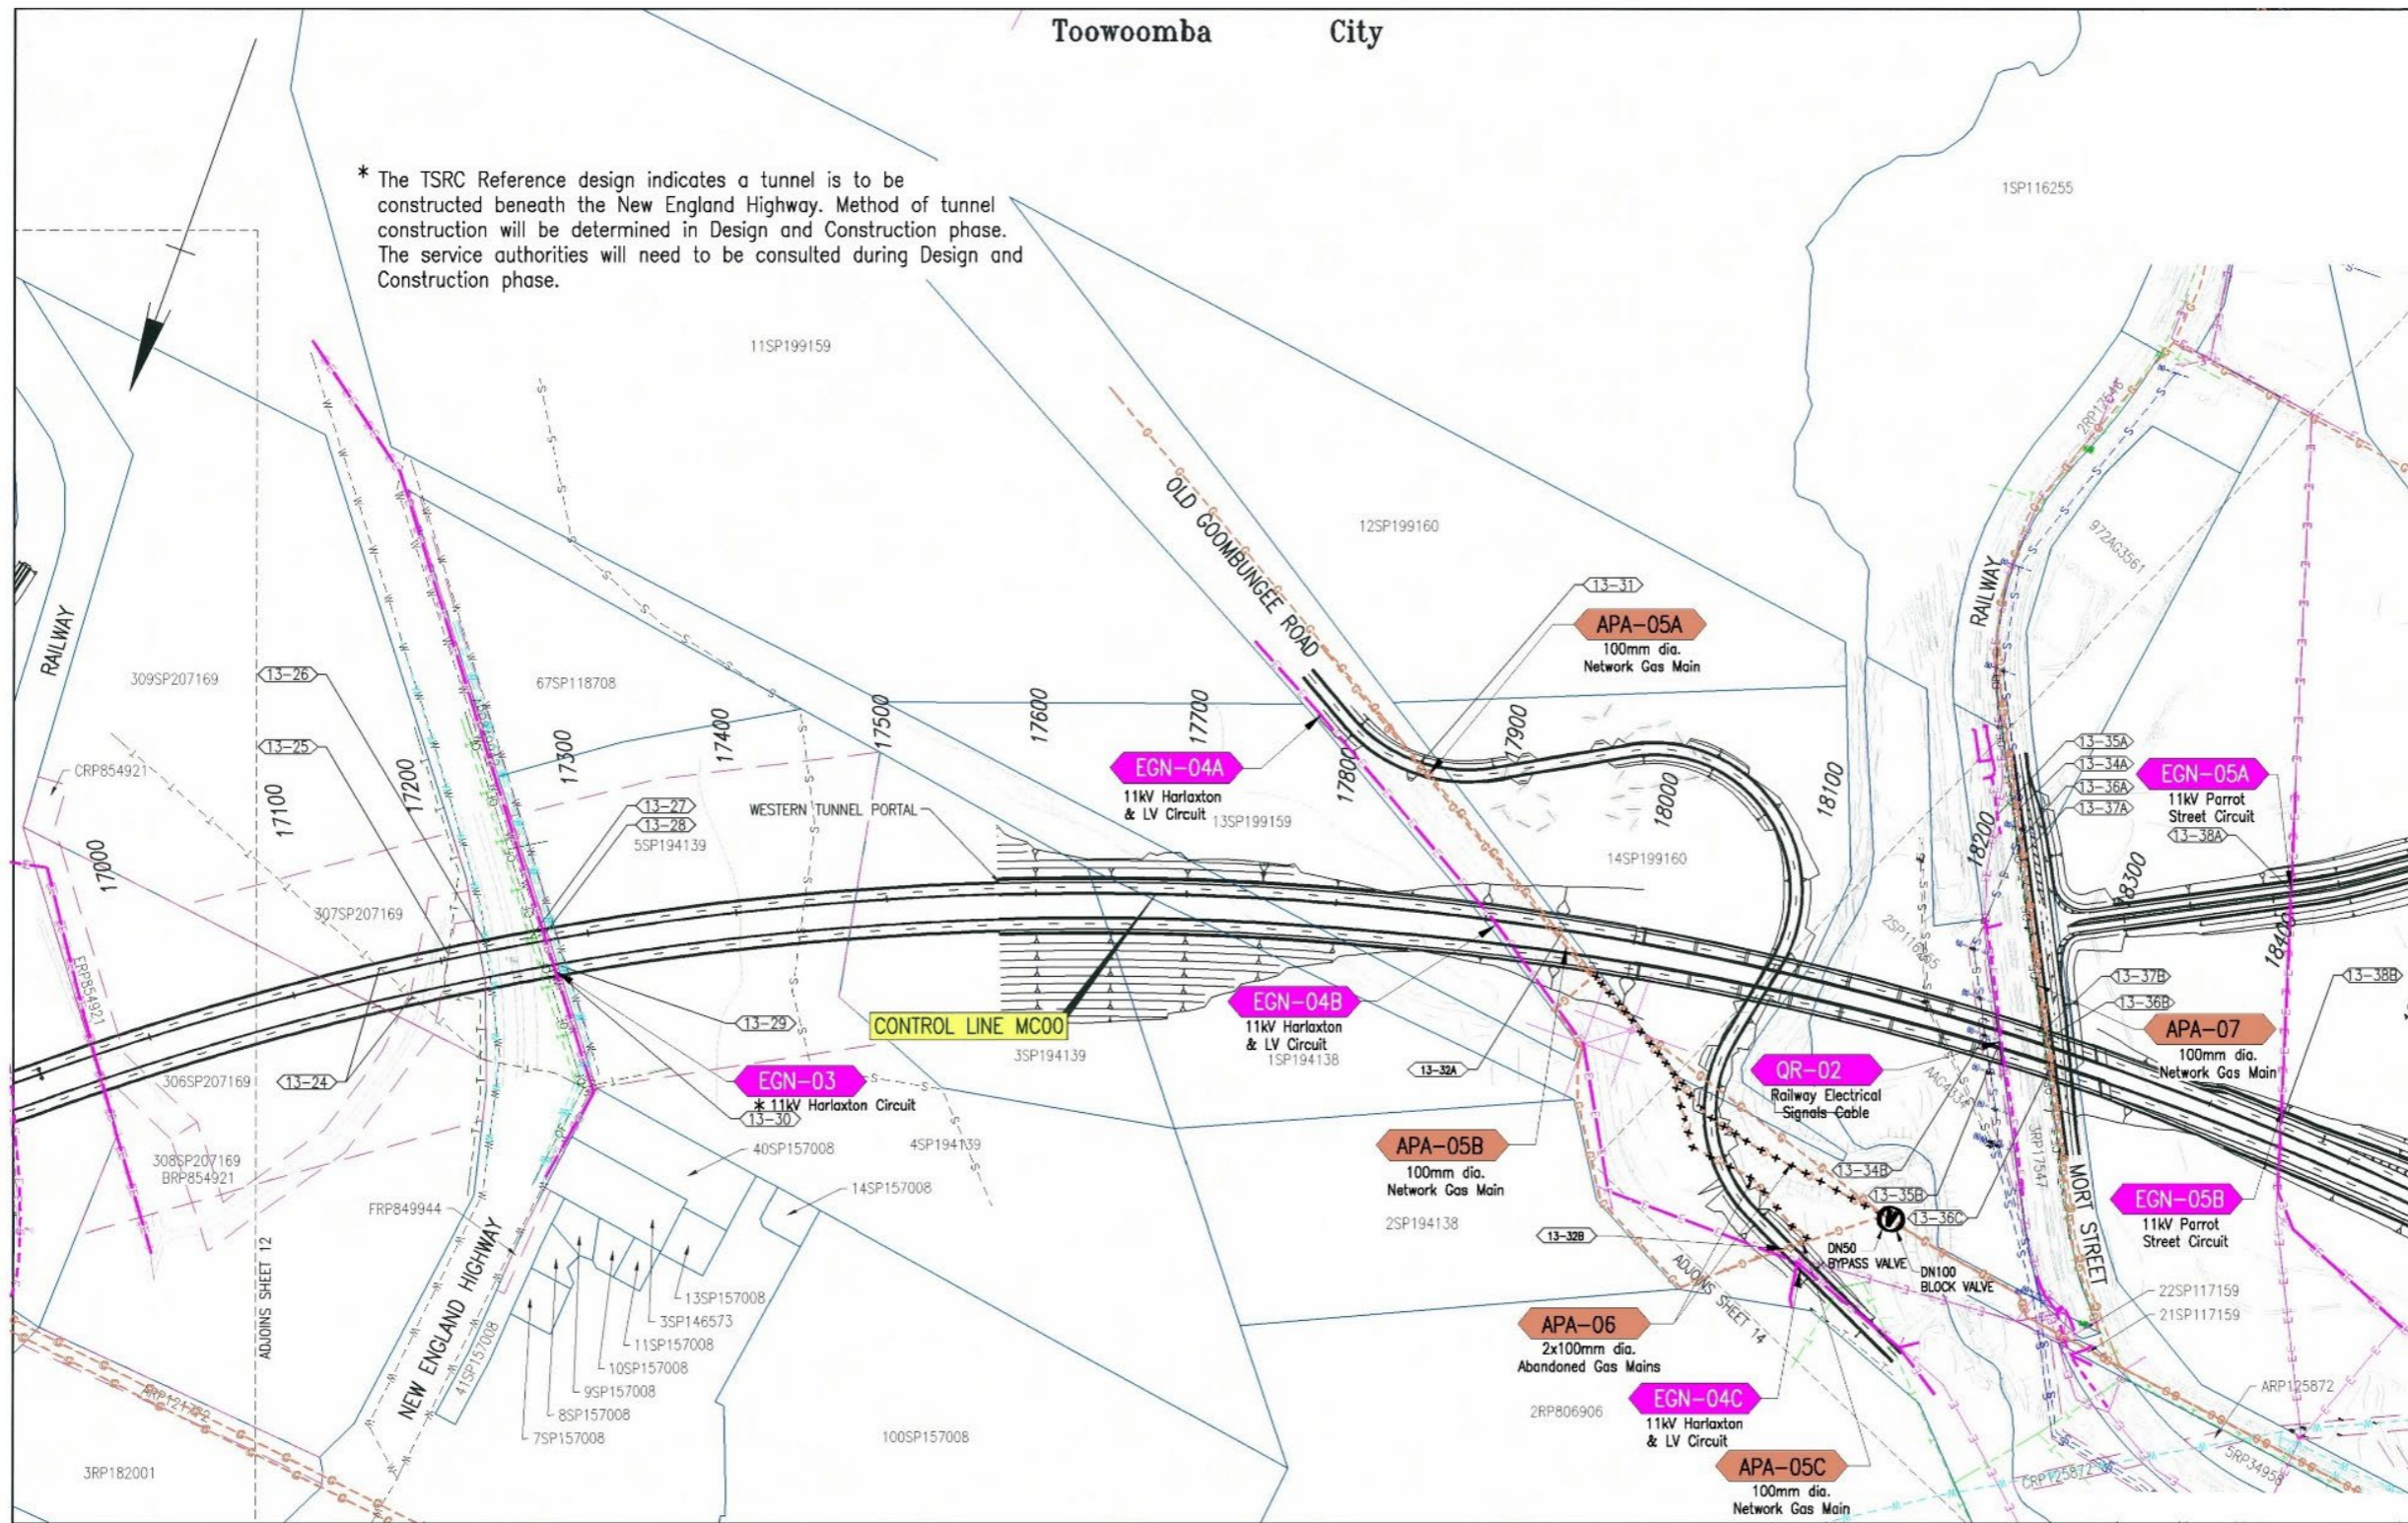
(l) – Public utility plant – Conflict Plans generic example – sheet 8 of 11
